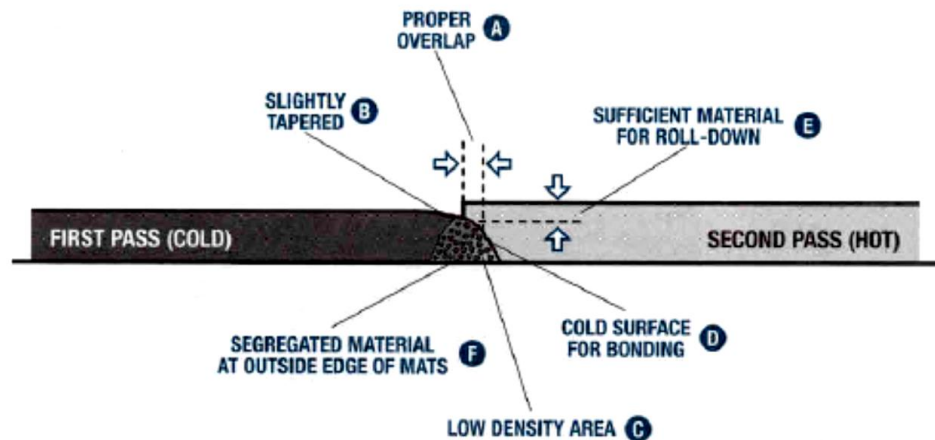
Diagram. Longitudinal Joint Construction for Full Width Construction. ⁽²⁾
